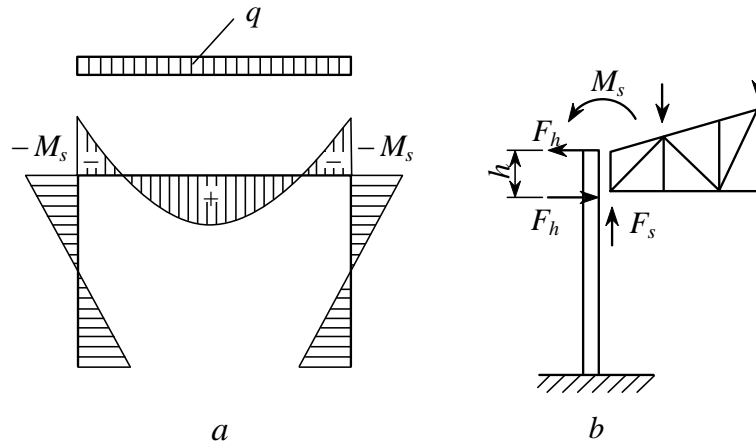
Support moment in frame with collar truss and design combinations of moments in support sections of trusses
